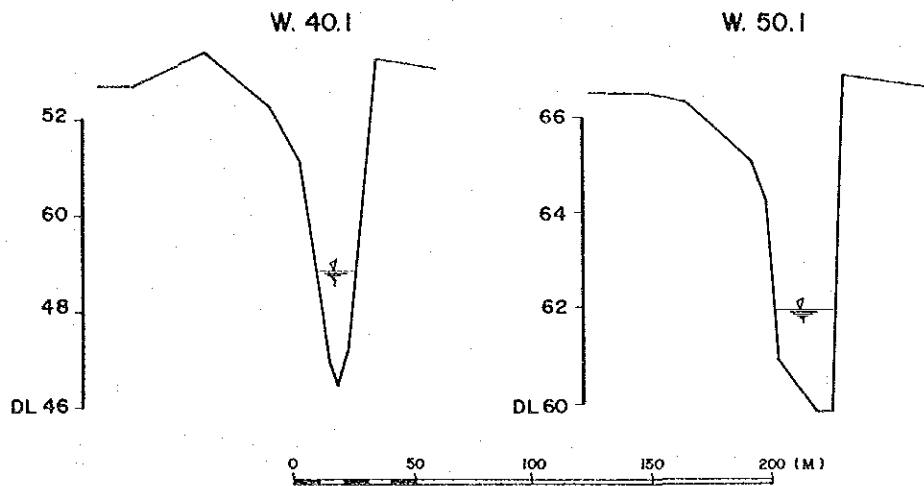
TYPICAL CROSS SECTIONS OF THE EXISTING K. WIDAS (2 / 5)
